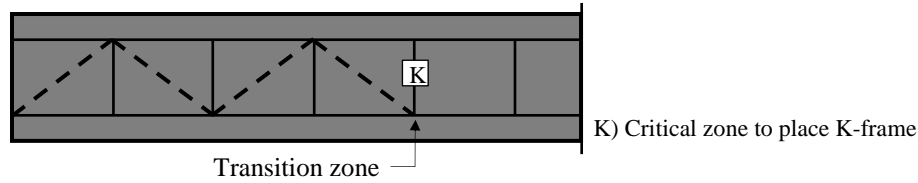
Transition Zone between Braced and Unbraced Tub Girder
